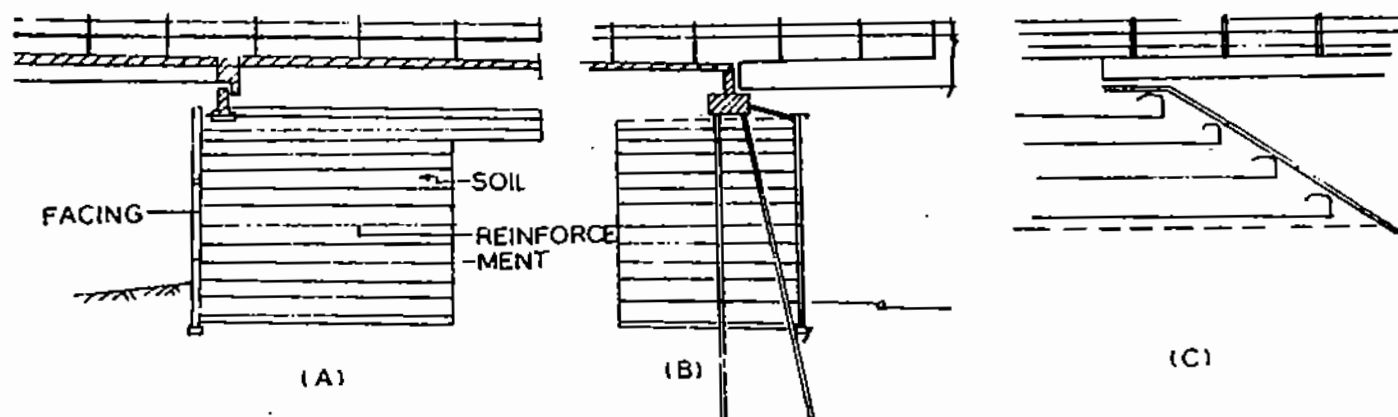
BRIDGE ABUTMENTS (A) WITHOUT PILE SUPPORT (B) WITH PILE SUPPORT (C) SLOPING
